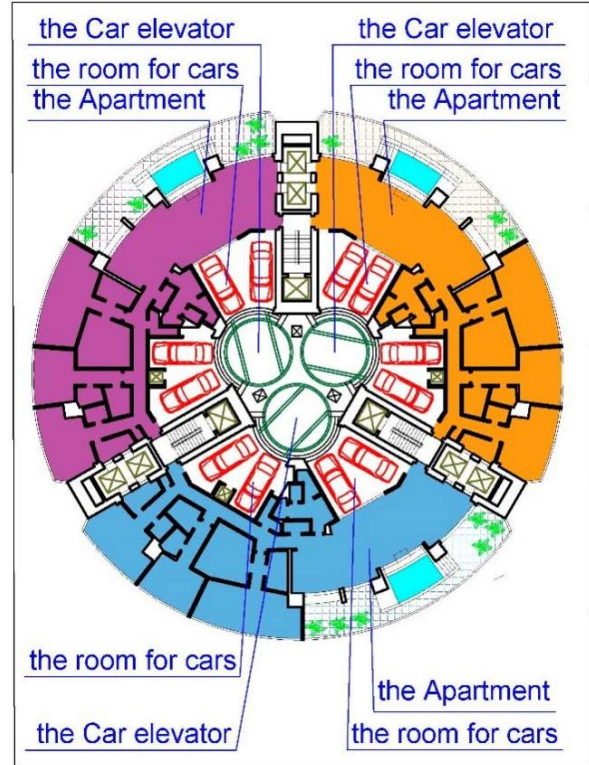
“The Hamilton Scotts / Sky Garage Apartments”, Singapore City, 2012 (a typical floor plan) [65]
